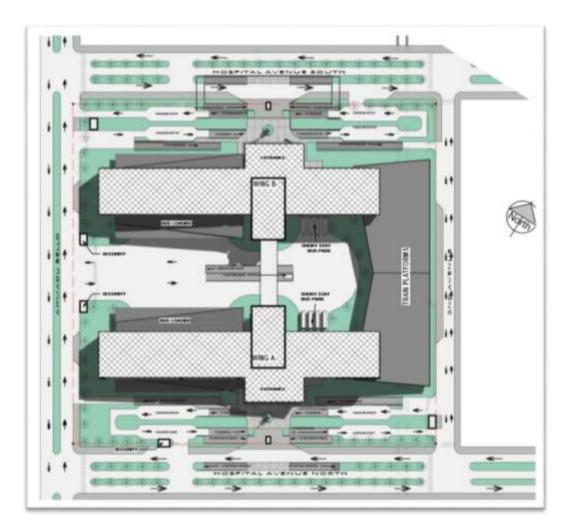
Proposed design site plan Source: Researcher's design proposal, (2020) The plan was positioned on the site as illustrated on figure 4.50 above. Parts of the site were highlighted at the ground level of the design and blow-up of some sections to show more details view of the plans.
